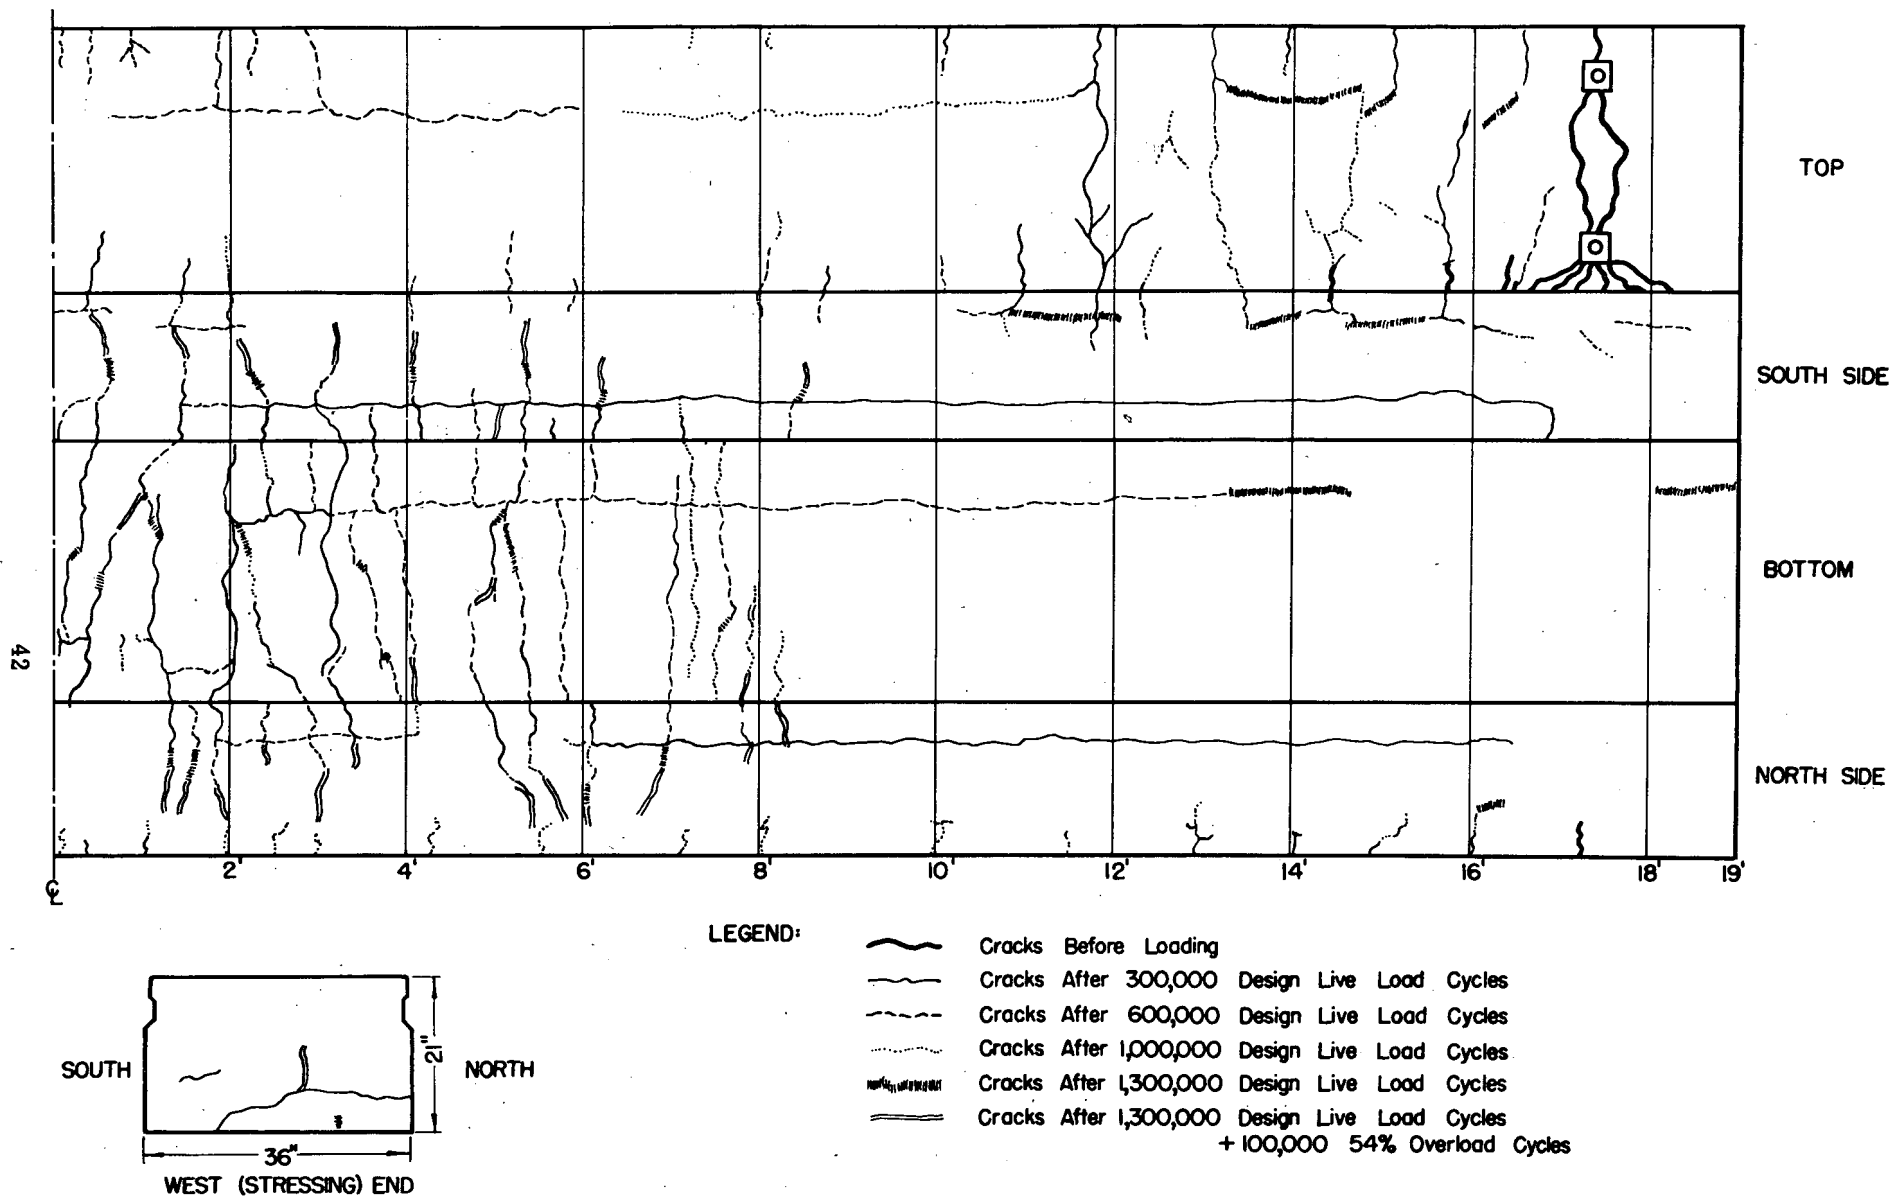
DEVELOPED VIEW OF TEST BEAM SHOWING CRACKS
